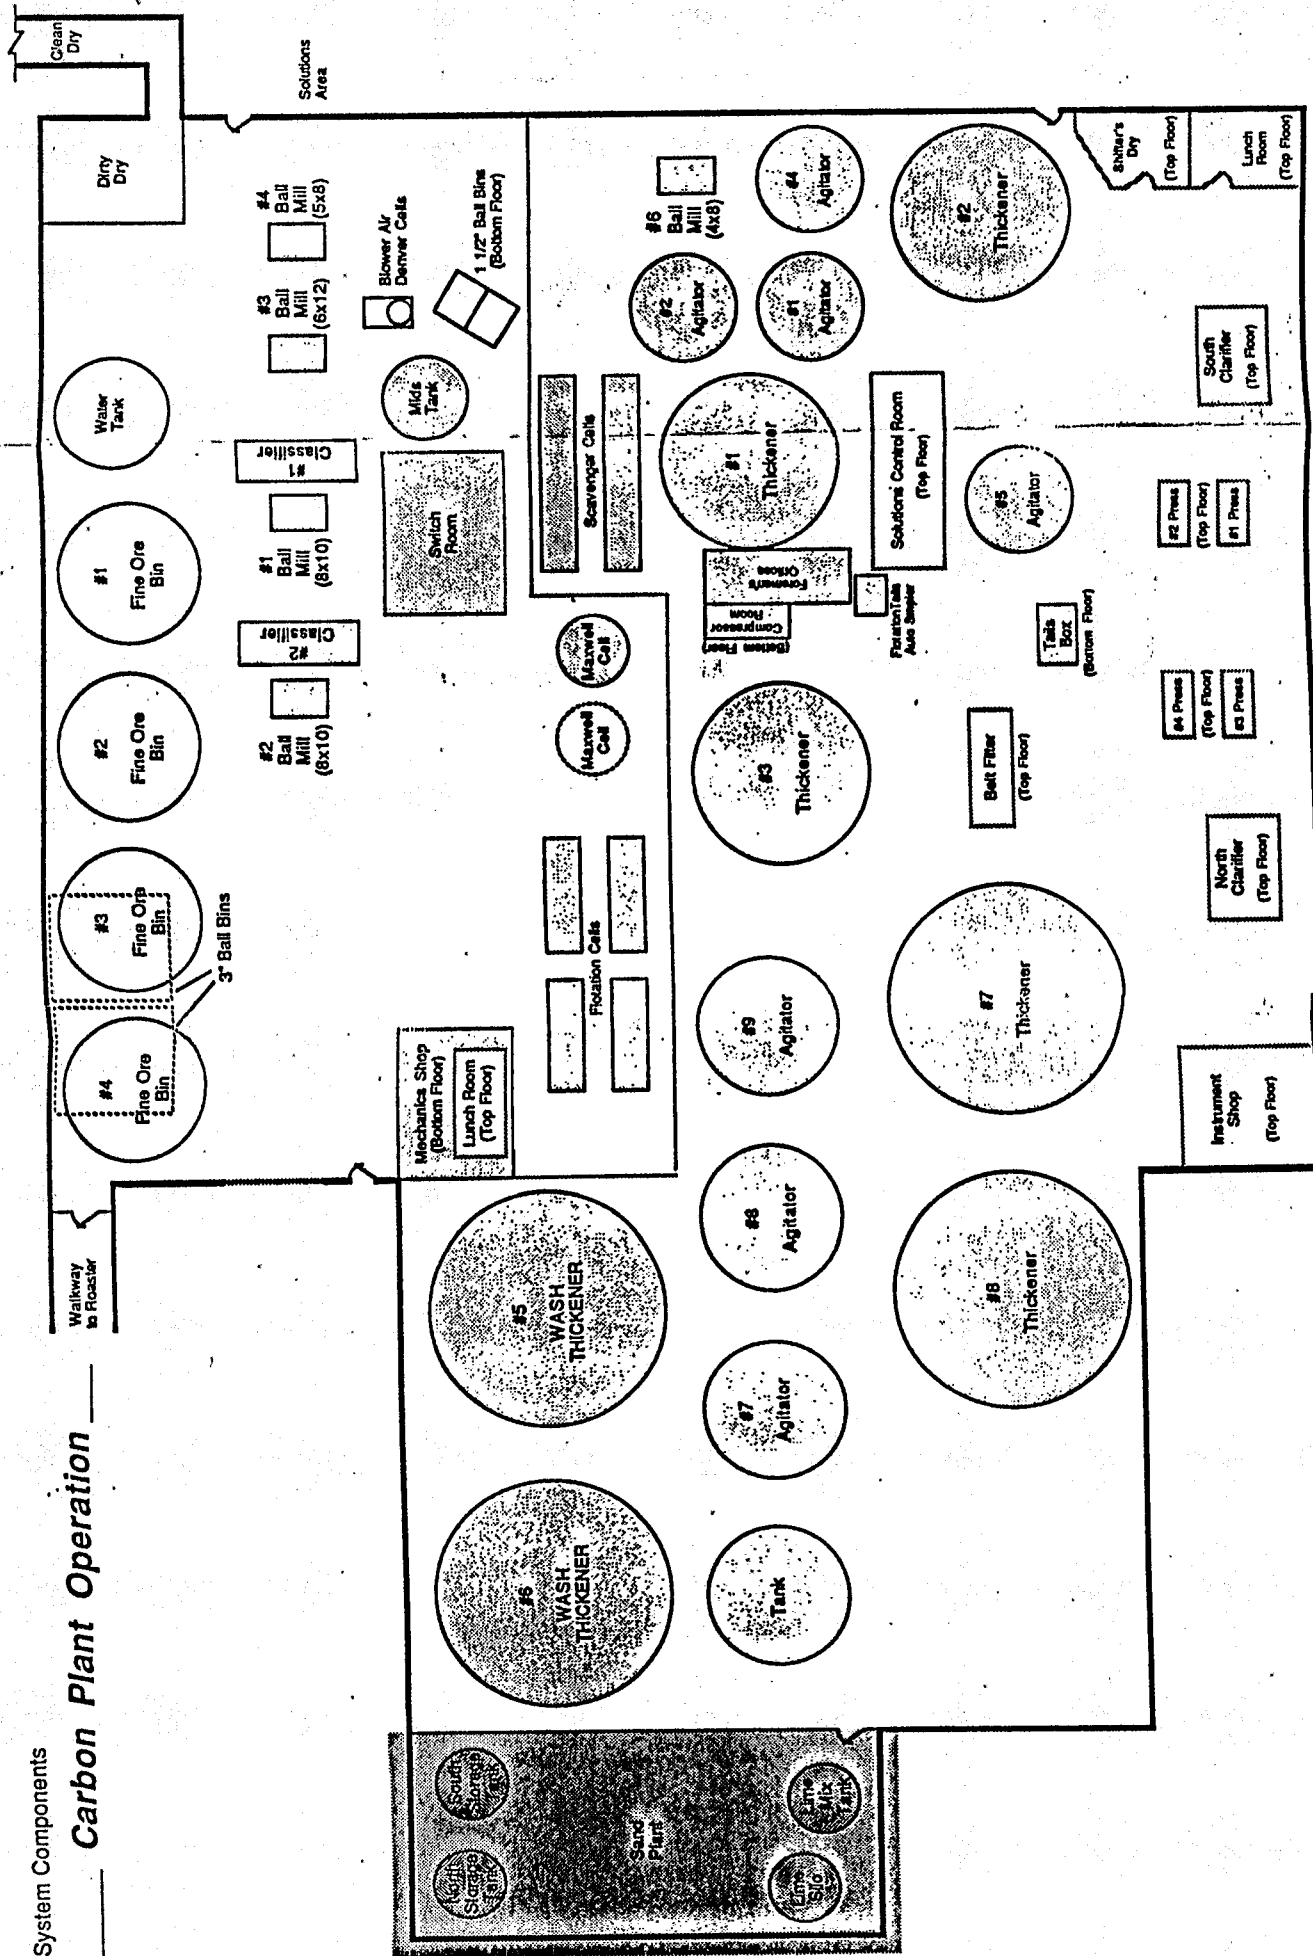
FLOOR PLAN OF MILL BUILDING (Sand Plant highlighted)
